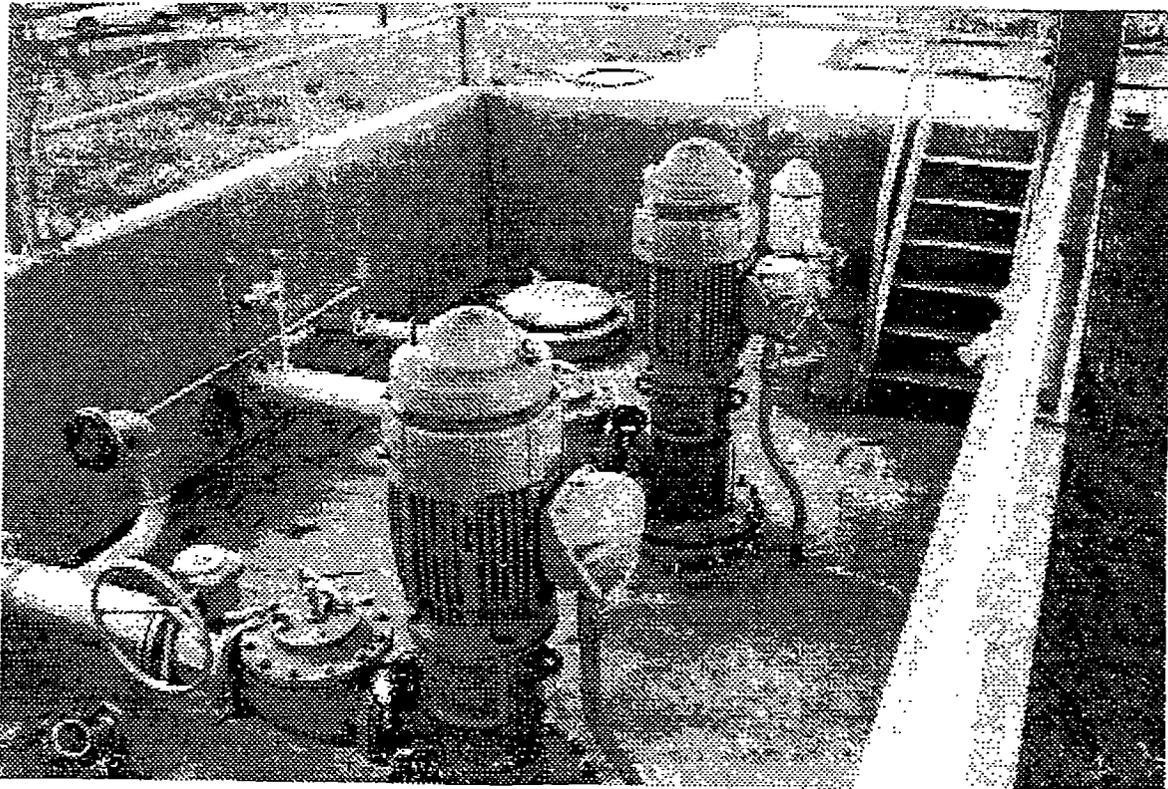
Day tank pump pit on top of tank prior to removal of cover, pumps and motors.
